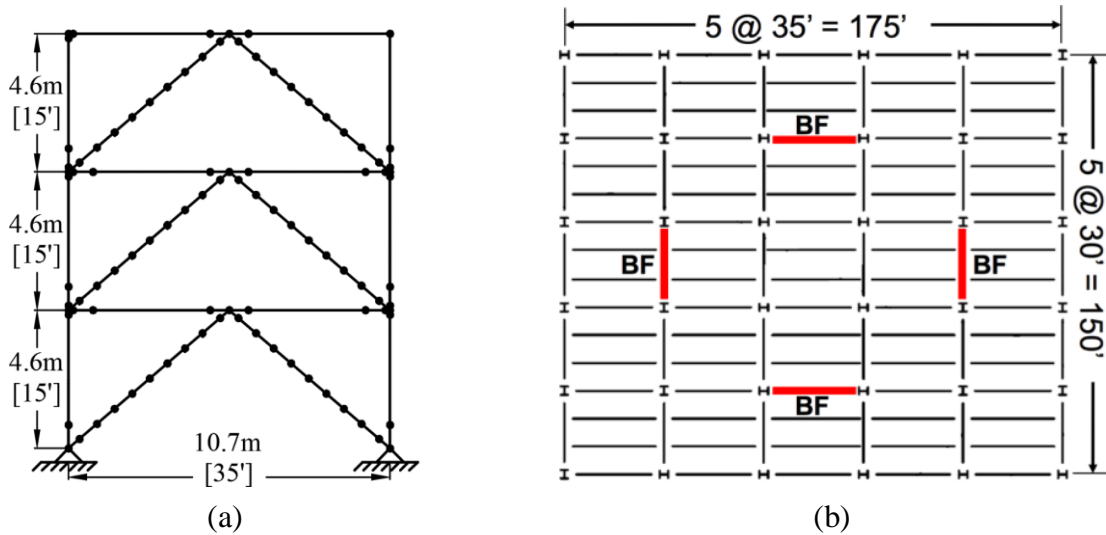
Prototype building: (a) elevation of 10.7 m. [35 ft.] bay; and (b) building floor plan showing two braced frames (BF) in each principal direction.
